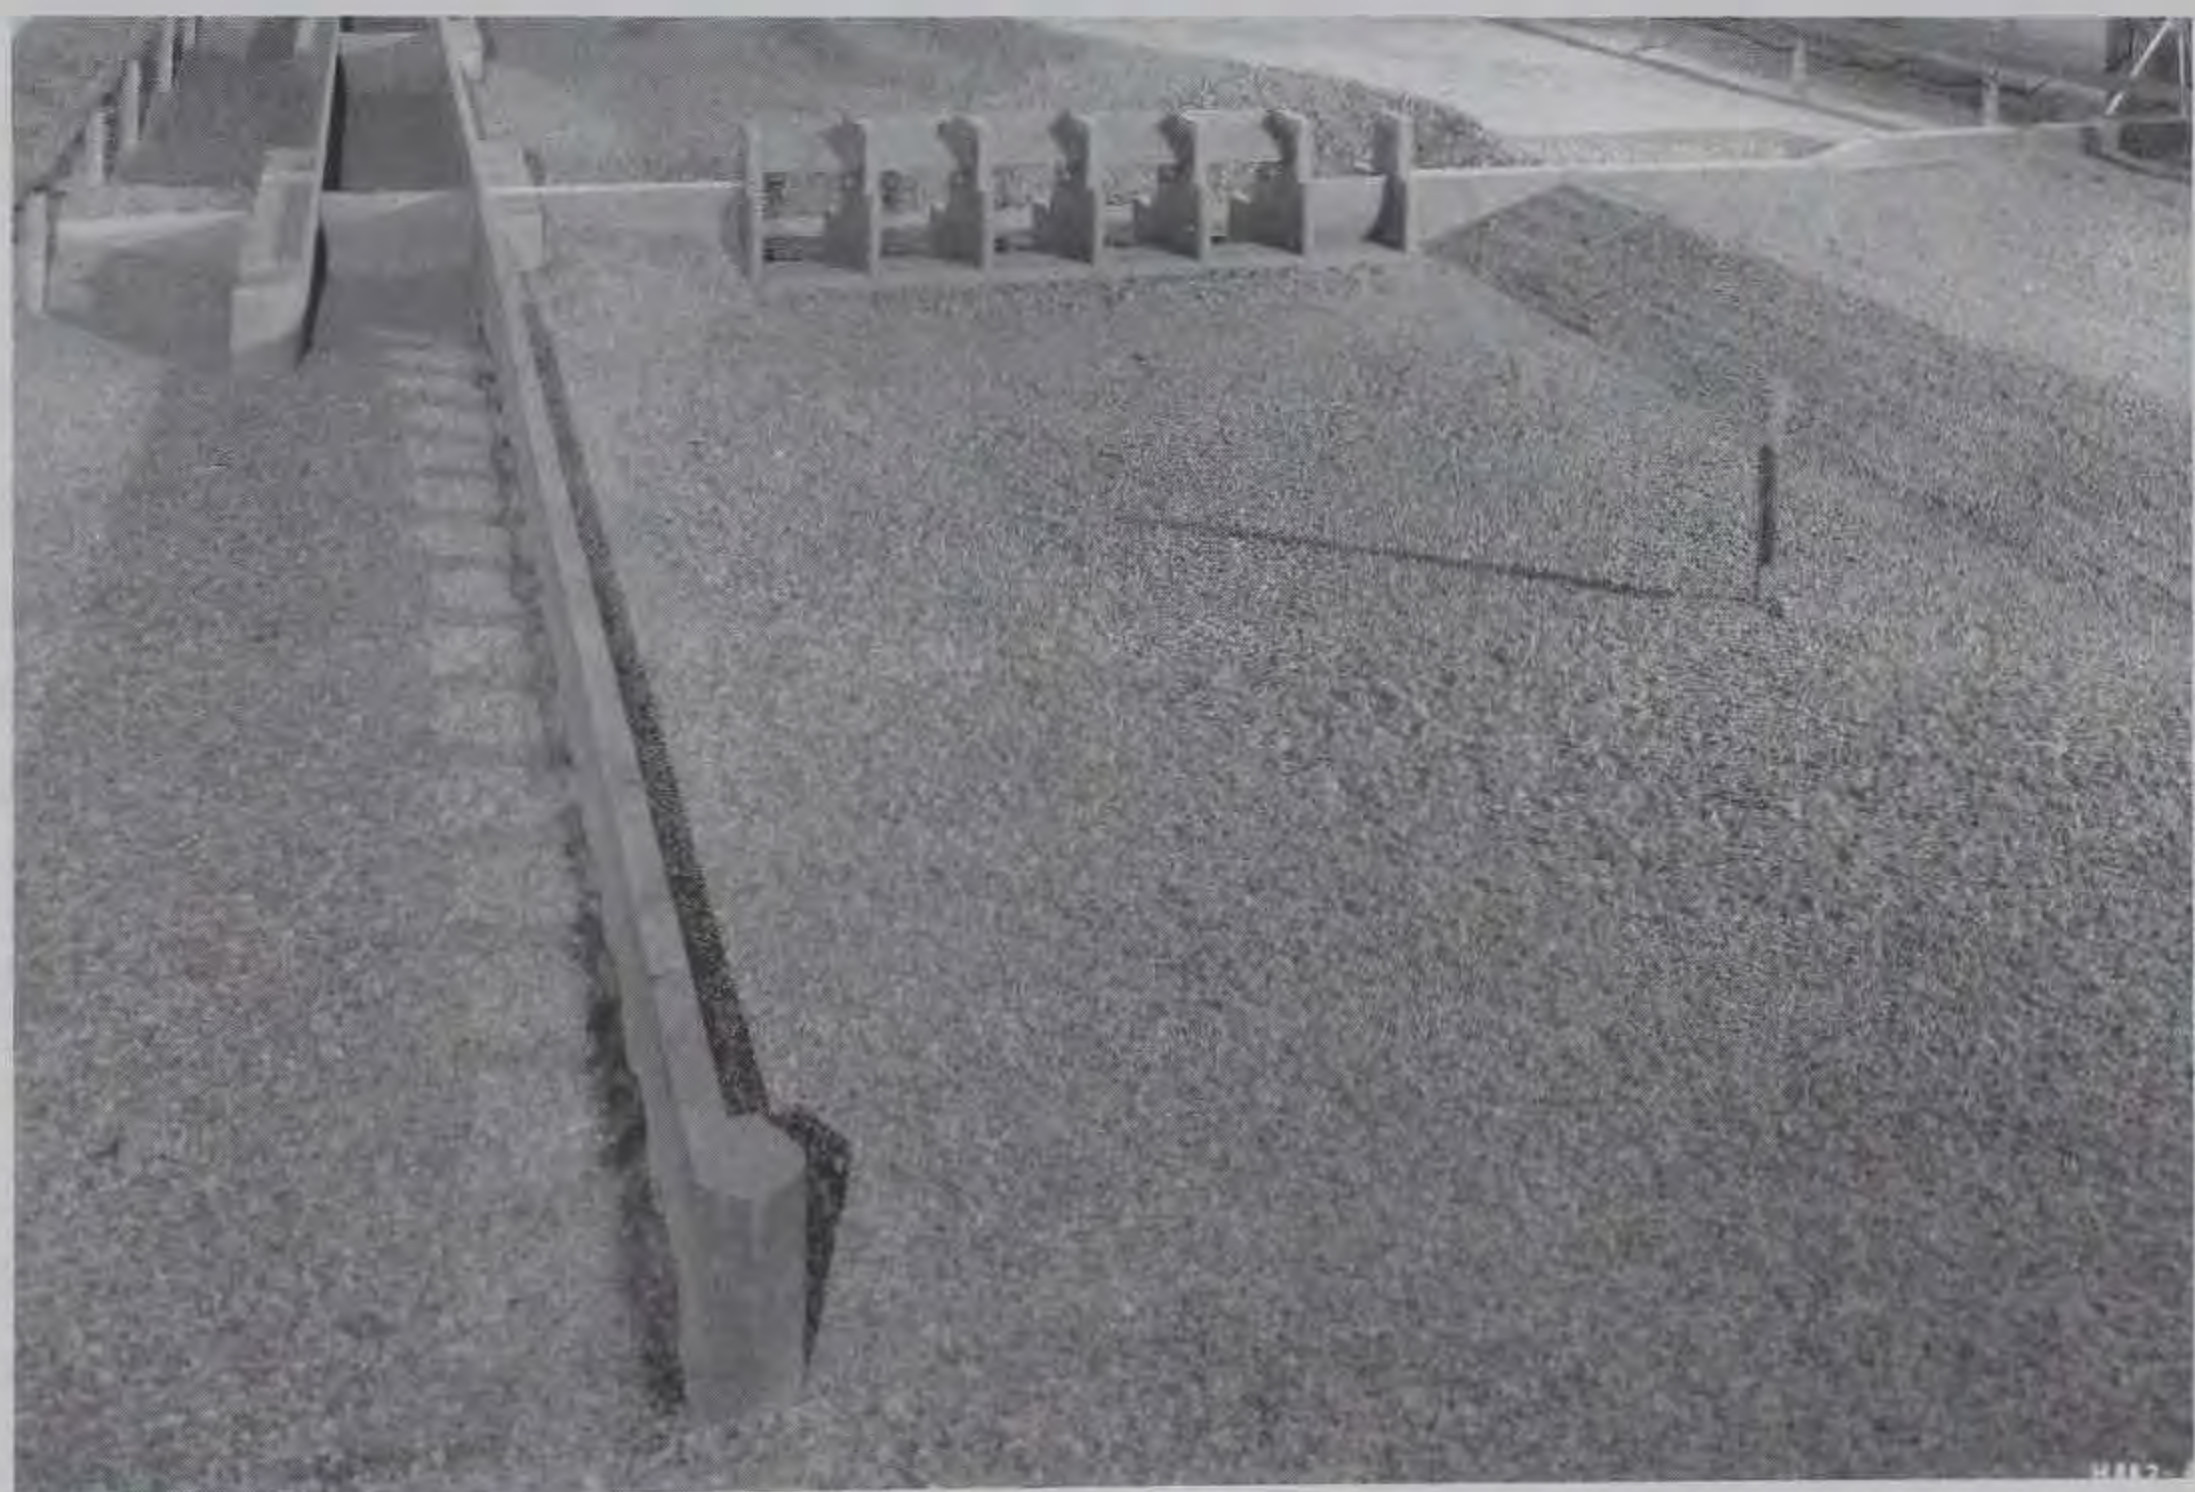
remained stable for extended runs of the single gate fully opened at normal upper pool and minimum tailwater. The riprap plan was changed from type 1 to type 2 because the longer and lower type 2 stilling basin required that changes be made to the exit channel and the riprap. The type 2 stilling basin is the recommended design.
